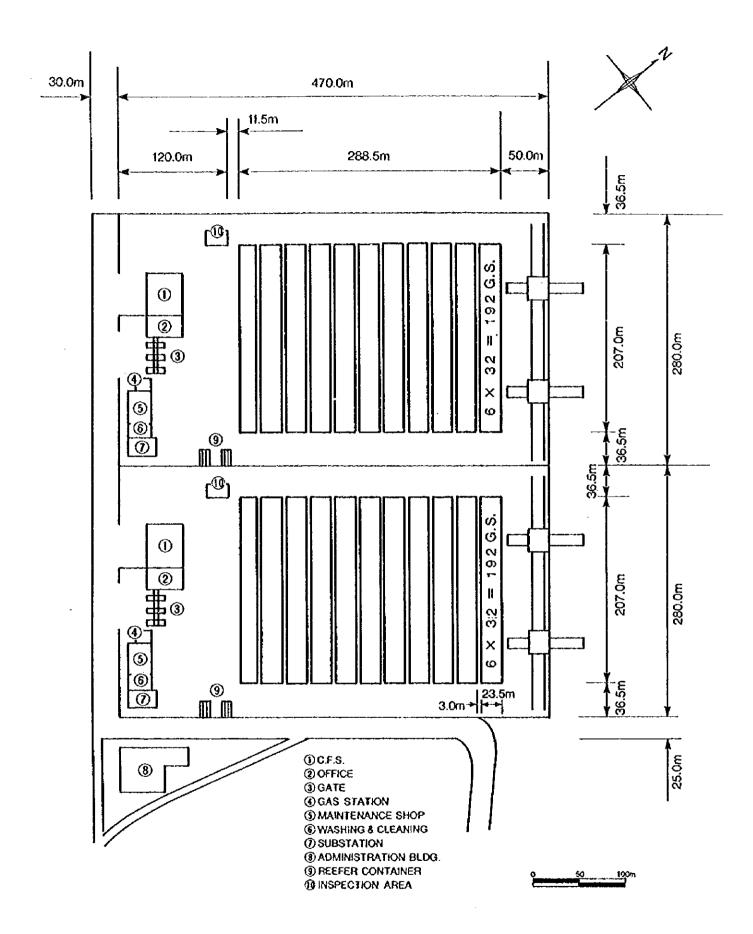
Port Layout for Short Term Plan (New Container Terminal)
